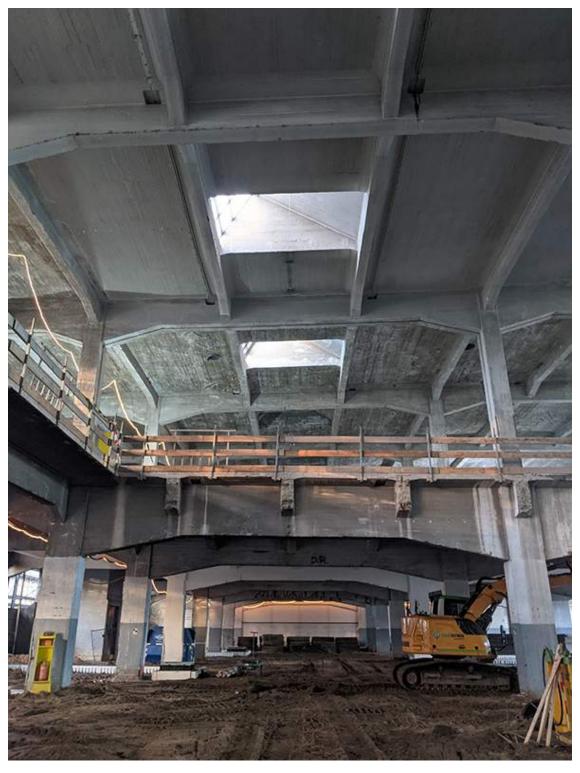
Fenix II: ground floor looking west, 1916 construction
